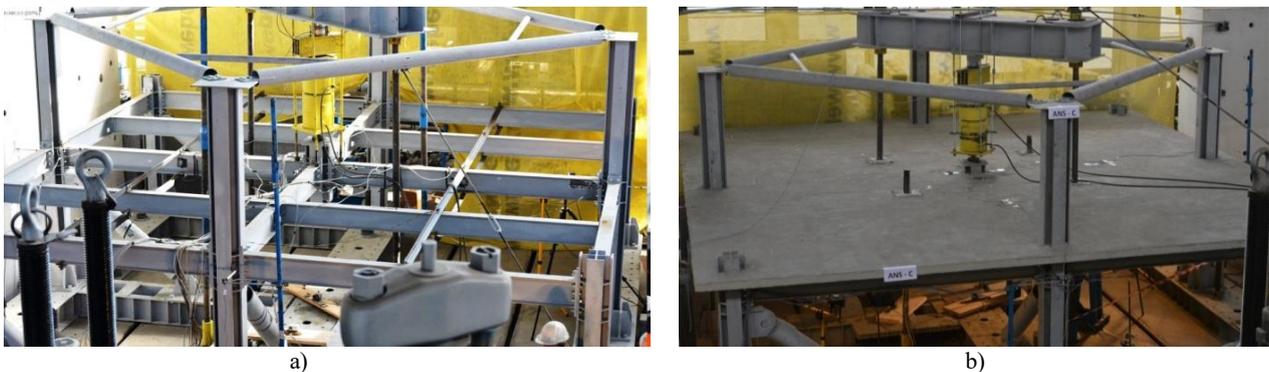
Views of two way steel specimen (a) and steel-concrete specimen [15], [16]
